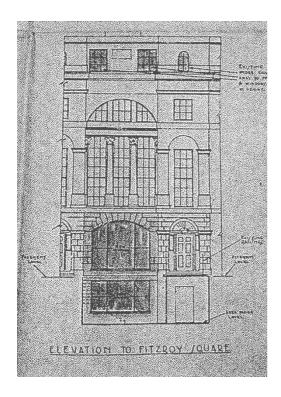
Elevation to Fitzroy Square in 1931, showing proposed (and executed) new basement and floors
